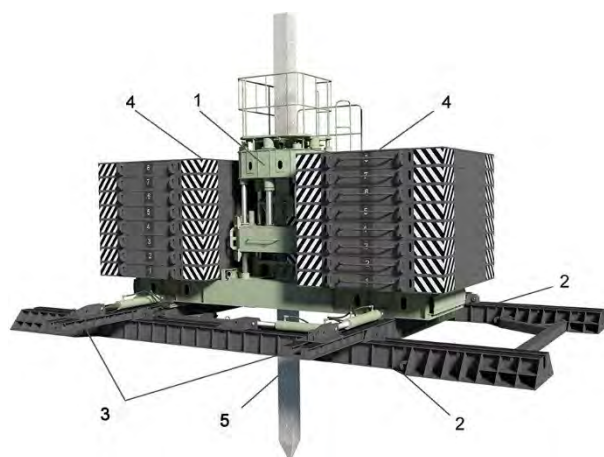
Modular Aggregate Piling System: 1 – piling machine, 2 – basic module, 3 – cross carriage, 4 – anchor loads, 5 – concrete pile
